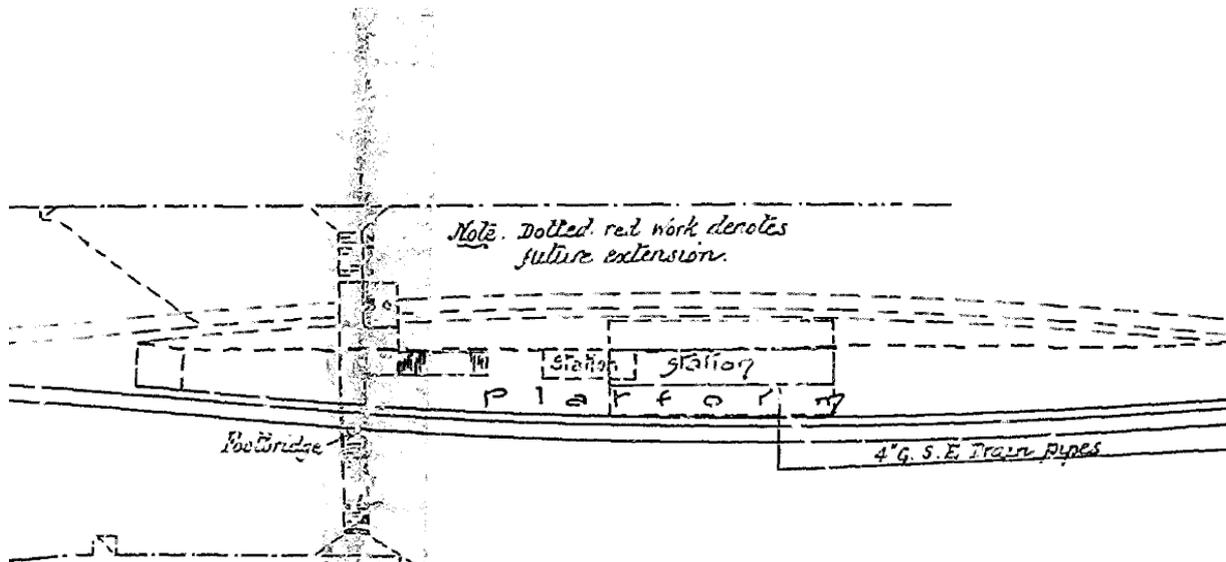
Detail of Figure 3-3 above, showing modification of 1899 platform for duplication, c. 1906 (Sydney Trains Virtual Plan Room)
